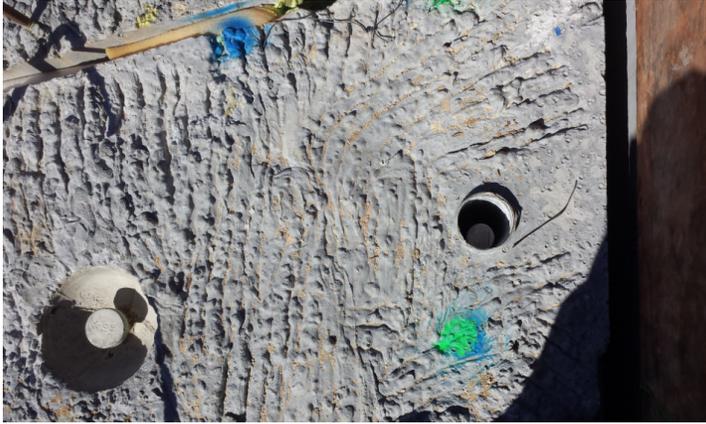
Dowel Connecting Abutment Headstock to Deck Unit
